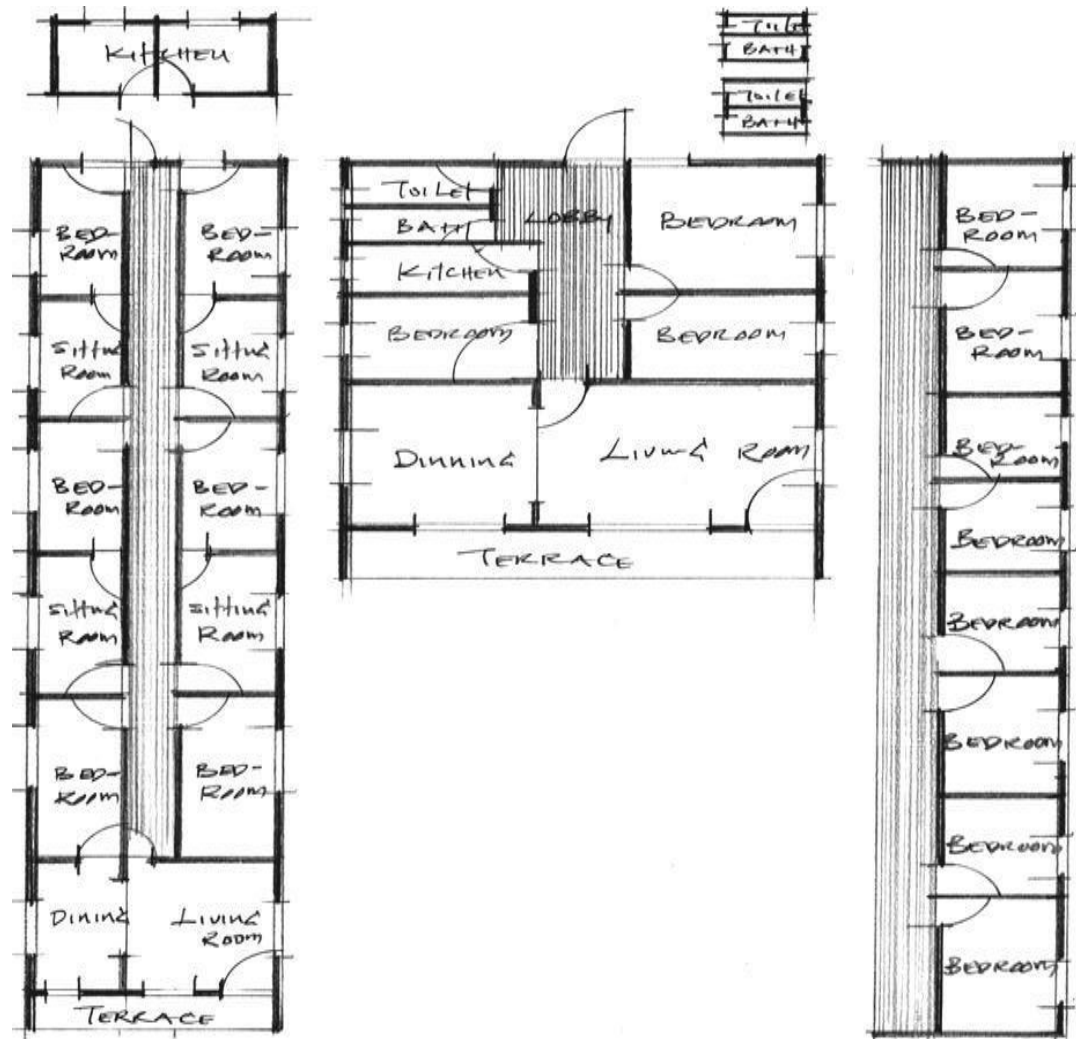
Floor plan of a typical hybrid family-compound Benin house
